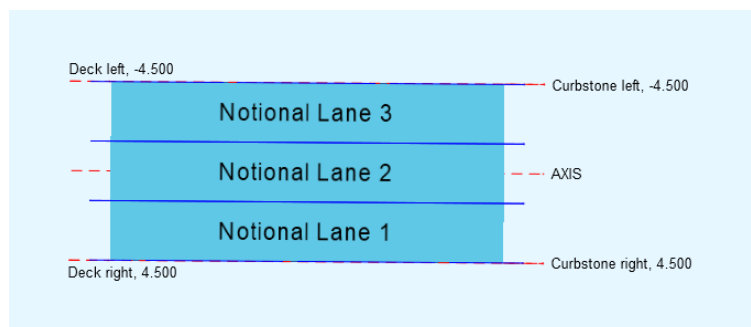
Center-aligned notional lanes for bridge with extended slab from SOFiSTiK based on Eurocode.
